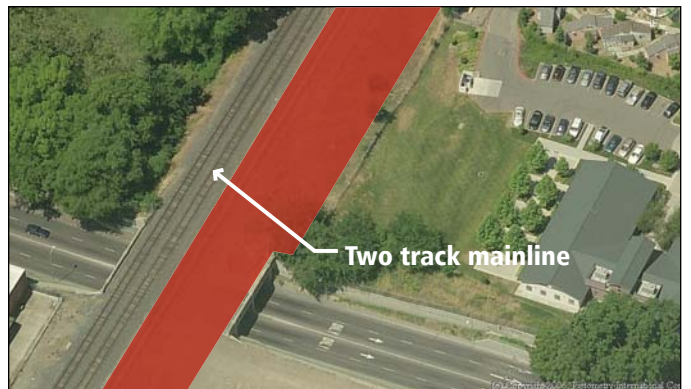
UPRR bridge over 16th Street showing future surplus track area and embankment in red.
